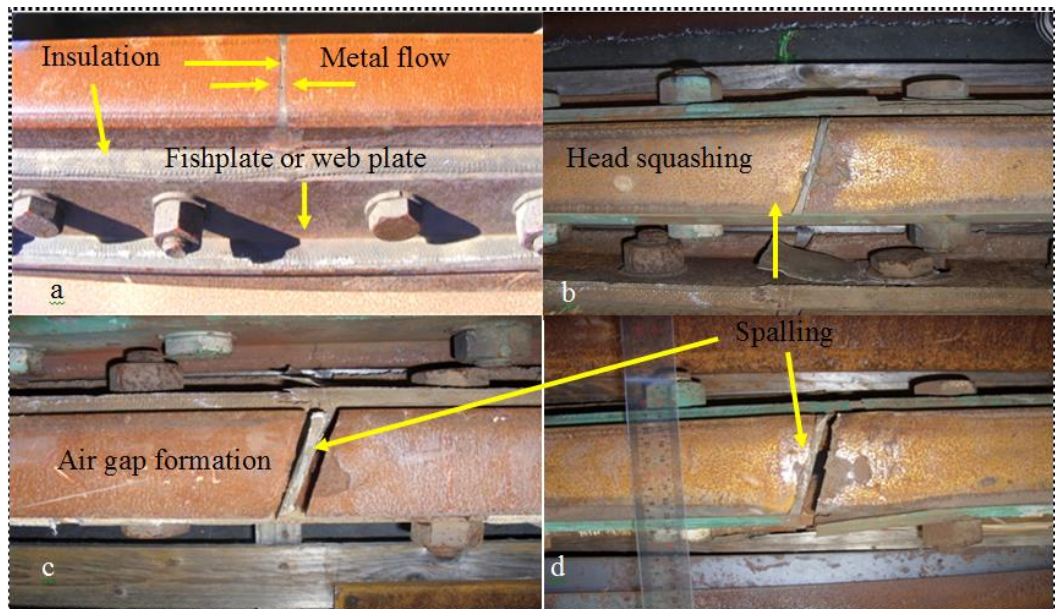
(a) A straight cut IRJ displaying evidence of gap narrowing; (b, c & d) rail head squashing, air gap formation, and spalling for one side of a rail joint
